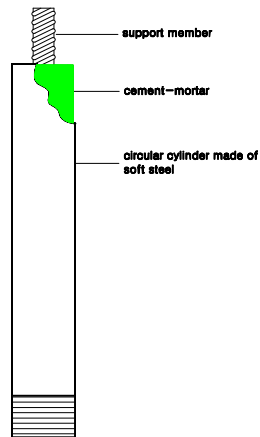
Specimen of rock and spiral bolts used laboratory pull-out test.
